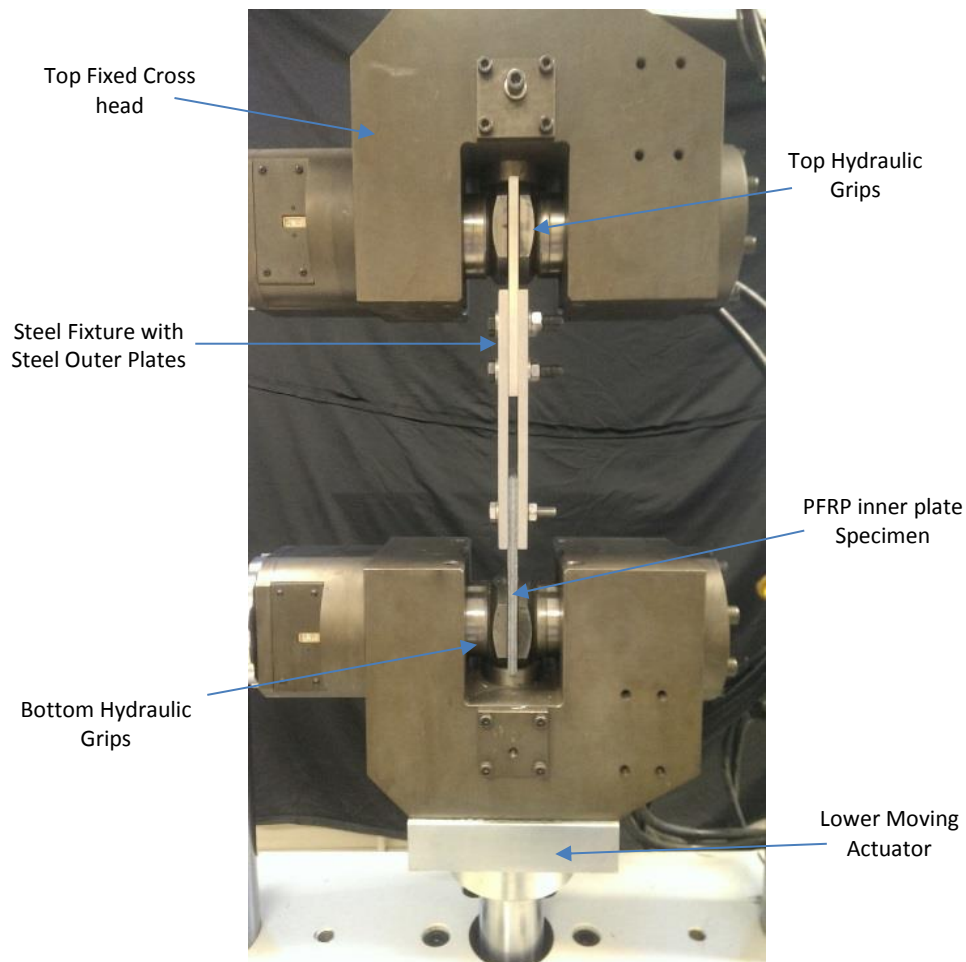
Double-Lap Shear Bolted Connection with Steel Outer Plates in the DARTEC 9500 universal Testing Machine prior to Tensile Test
